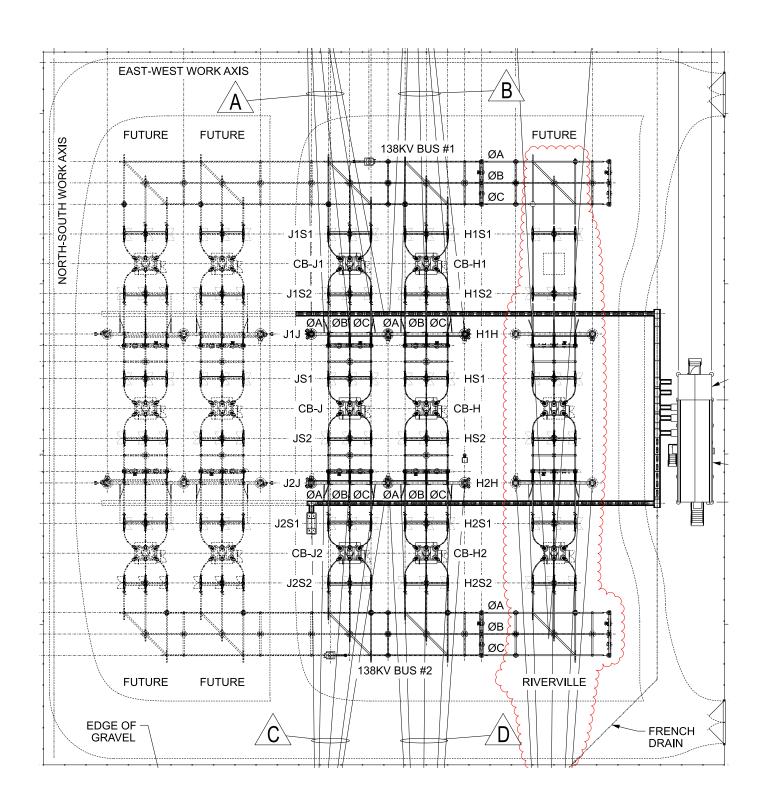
IMPROVEMENTS AT BOXWOOD 138 KV SUBSTATION
